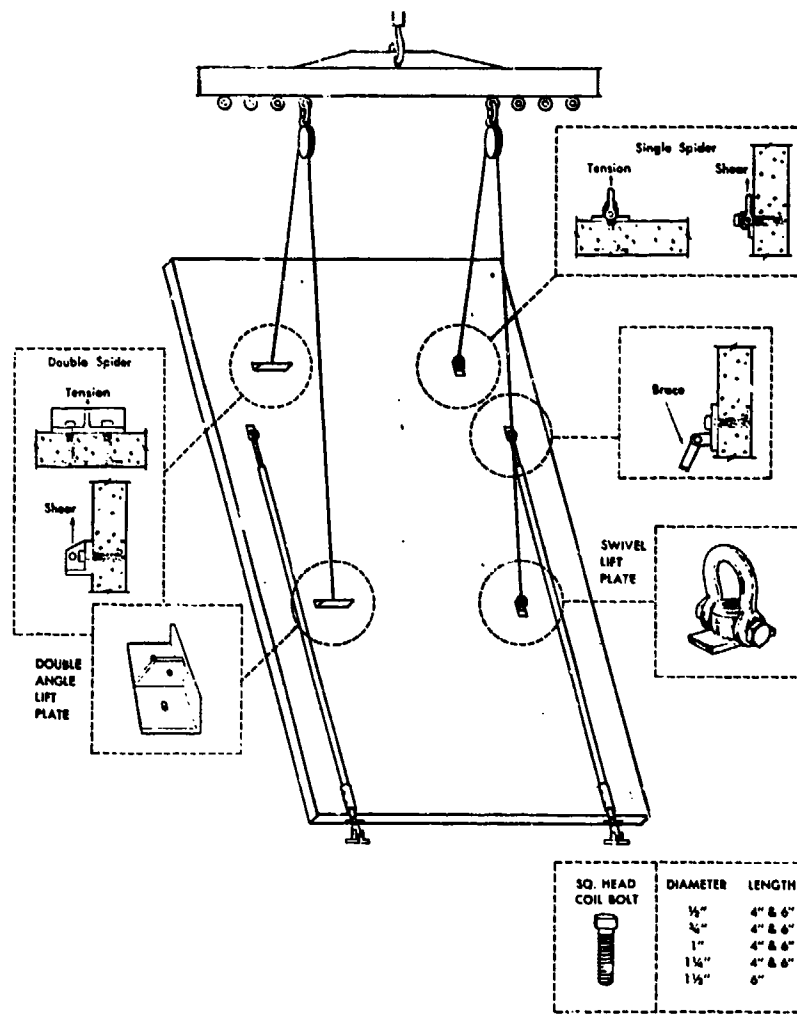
Lifting arrangement for precast panels (Courtesy of American Concrete Institute)
